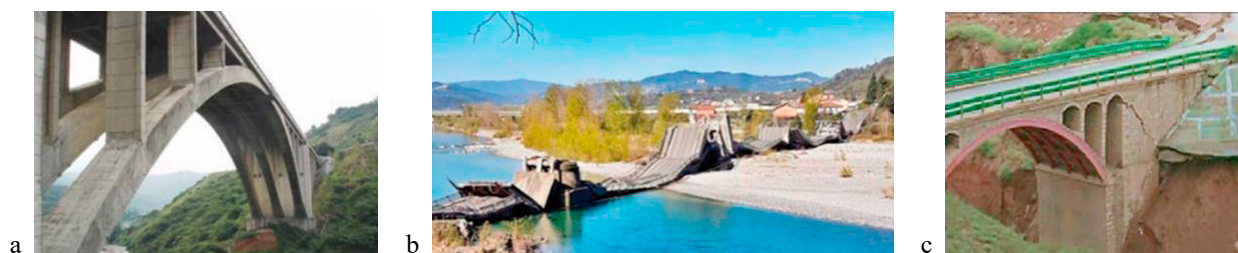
Examples of collapsed bridges due to longitudinal thrust on the abutment: (a) Caracas- La Guaira arch viaduct; (b) Albiano Magra bridge; (c) Yangpo bridge.
